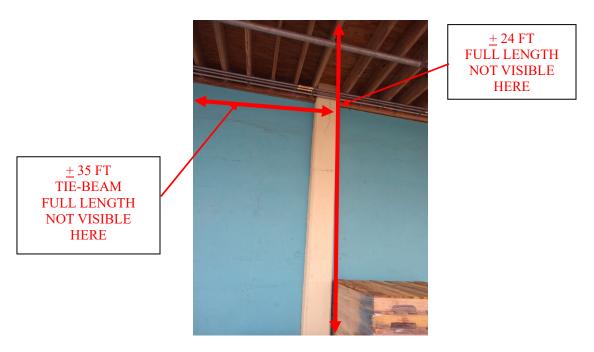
Location 15: Approximately 24 ft long new 12x12 concrete column. See detail 2/S102. Approximately 35 ft long new tie-beam. See detail 4/S103.
